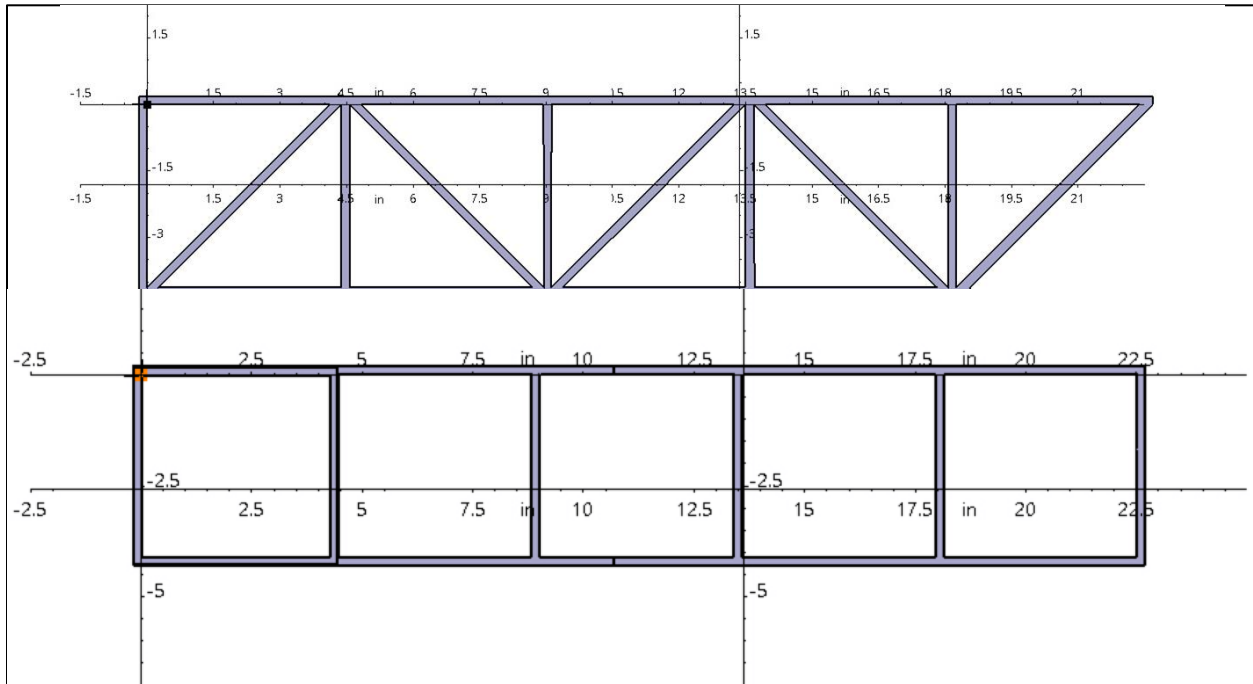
3D CAD drawings used to create the engineering drawings that students were given to complete their build projects. Views shown: left side and top.
